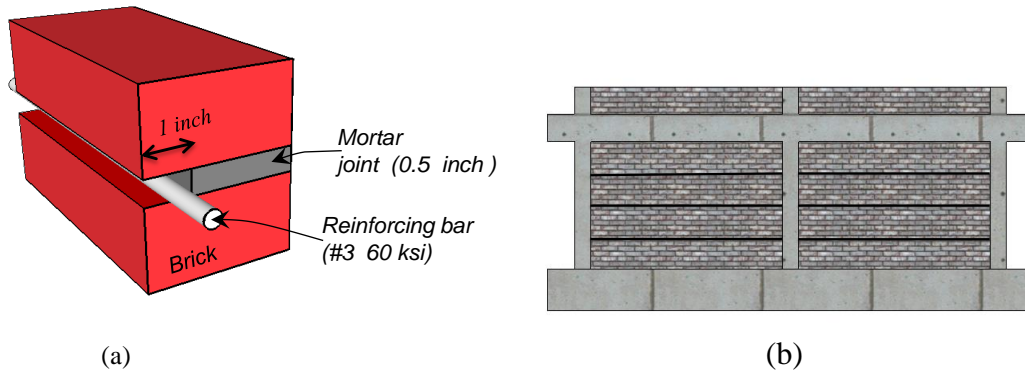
Retrofitting strategy for two-bay frame: (a) embedded horizontal reinforcement into groove, (b) retrofitted specimen (two-bay) with horizontal bars
